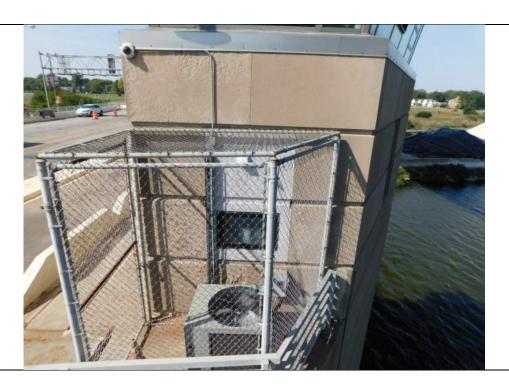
[Control House Exterior] -Mechanical cage general view, Looking North
